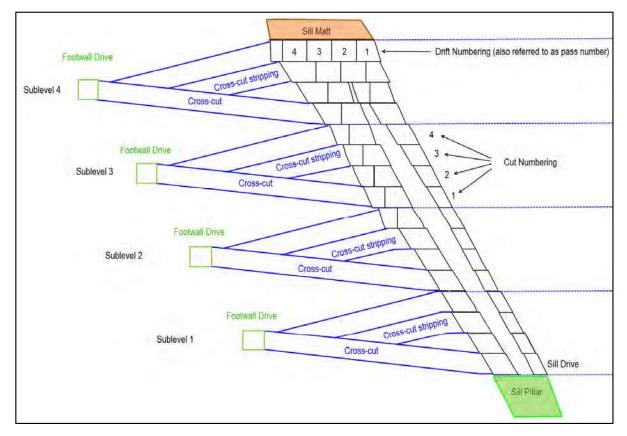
Schematic Cross Section Showing DAF Production Block Layout
